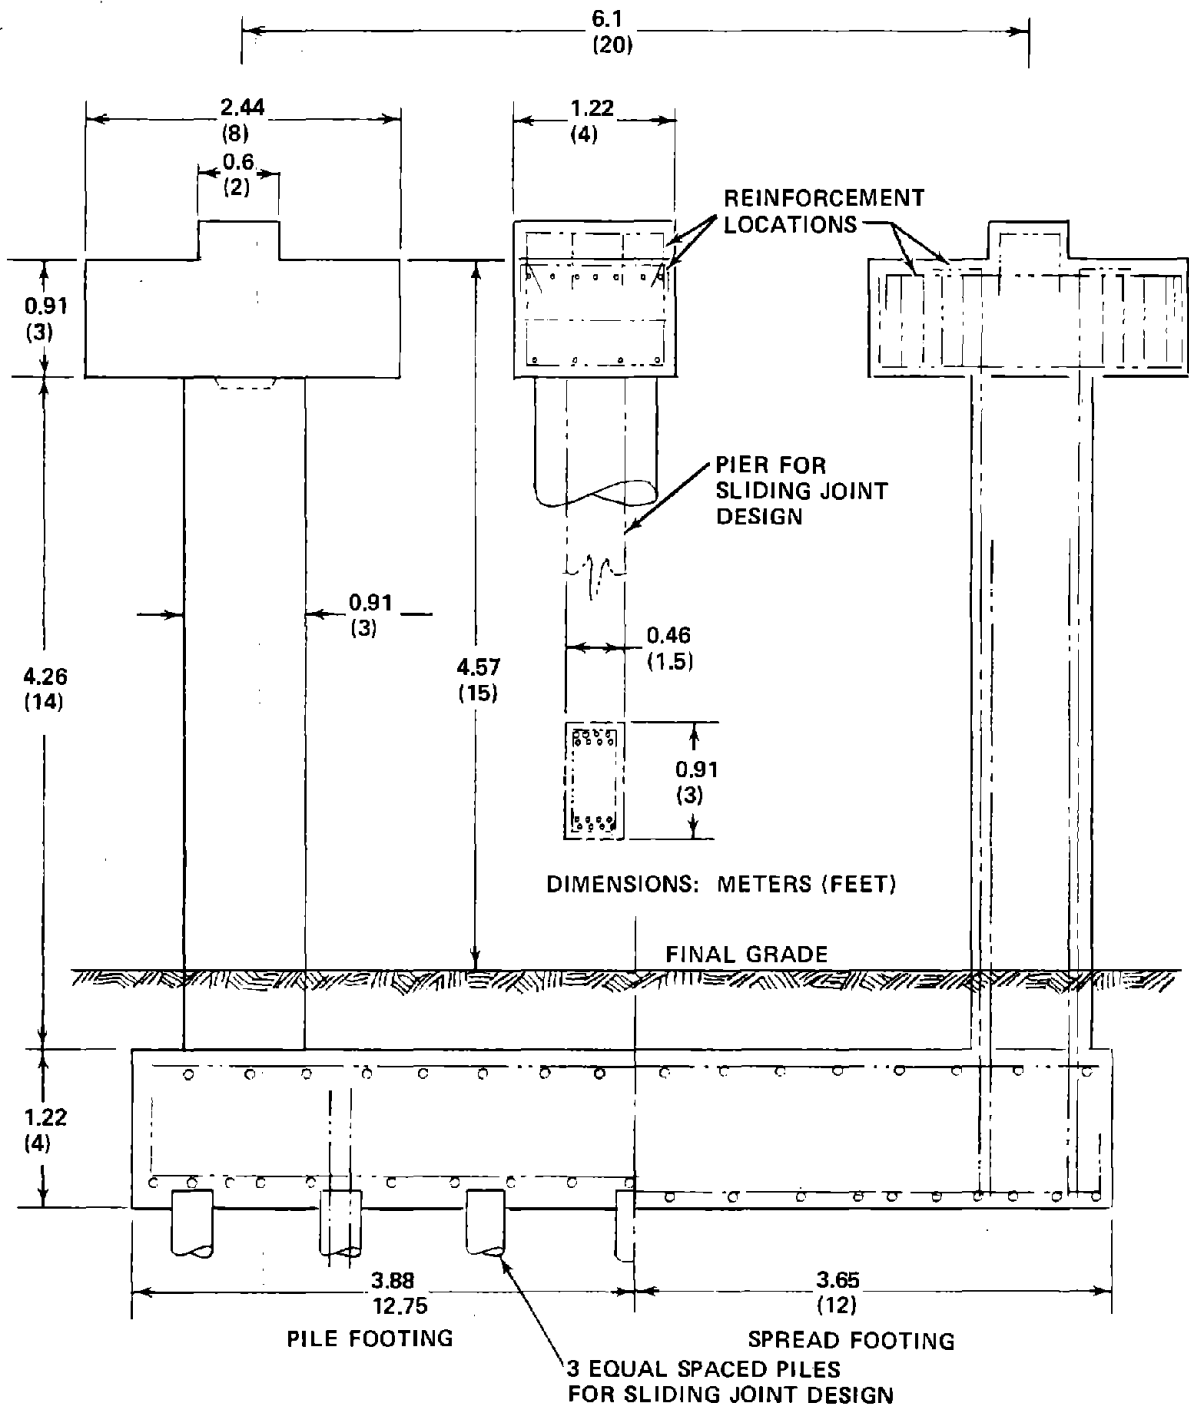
TYPICAL PIER AND FOOTING FOR 22.8 M (75 FT) SPAN
